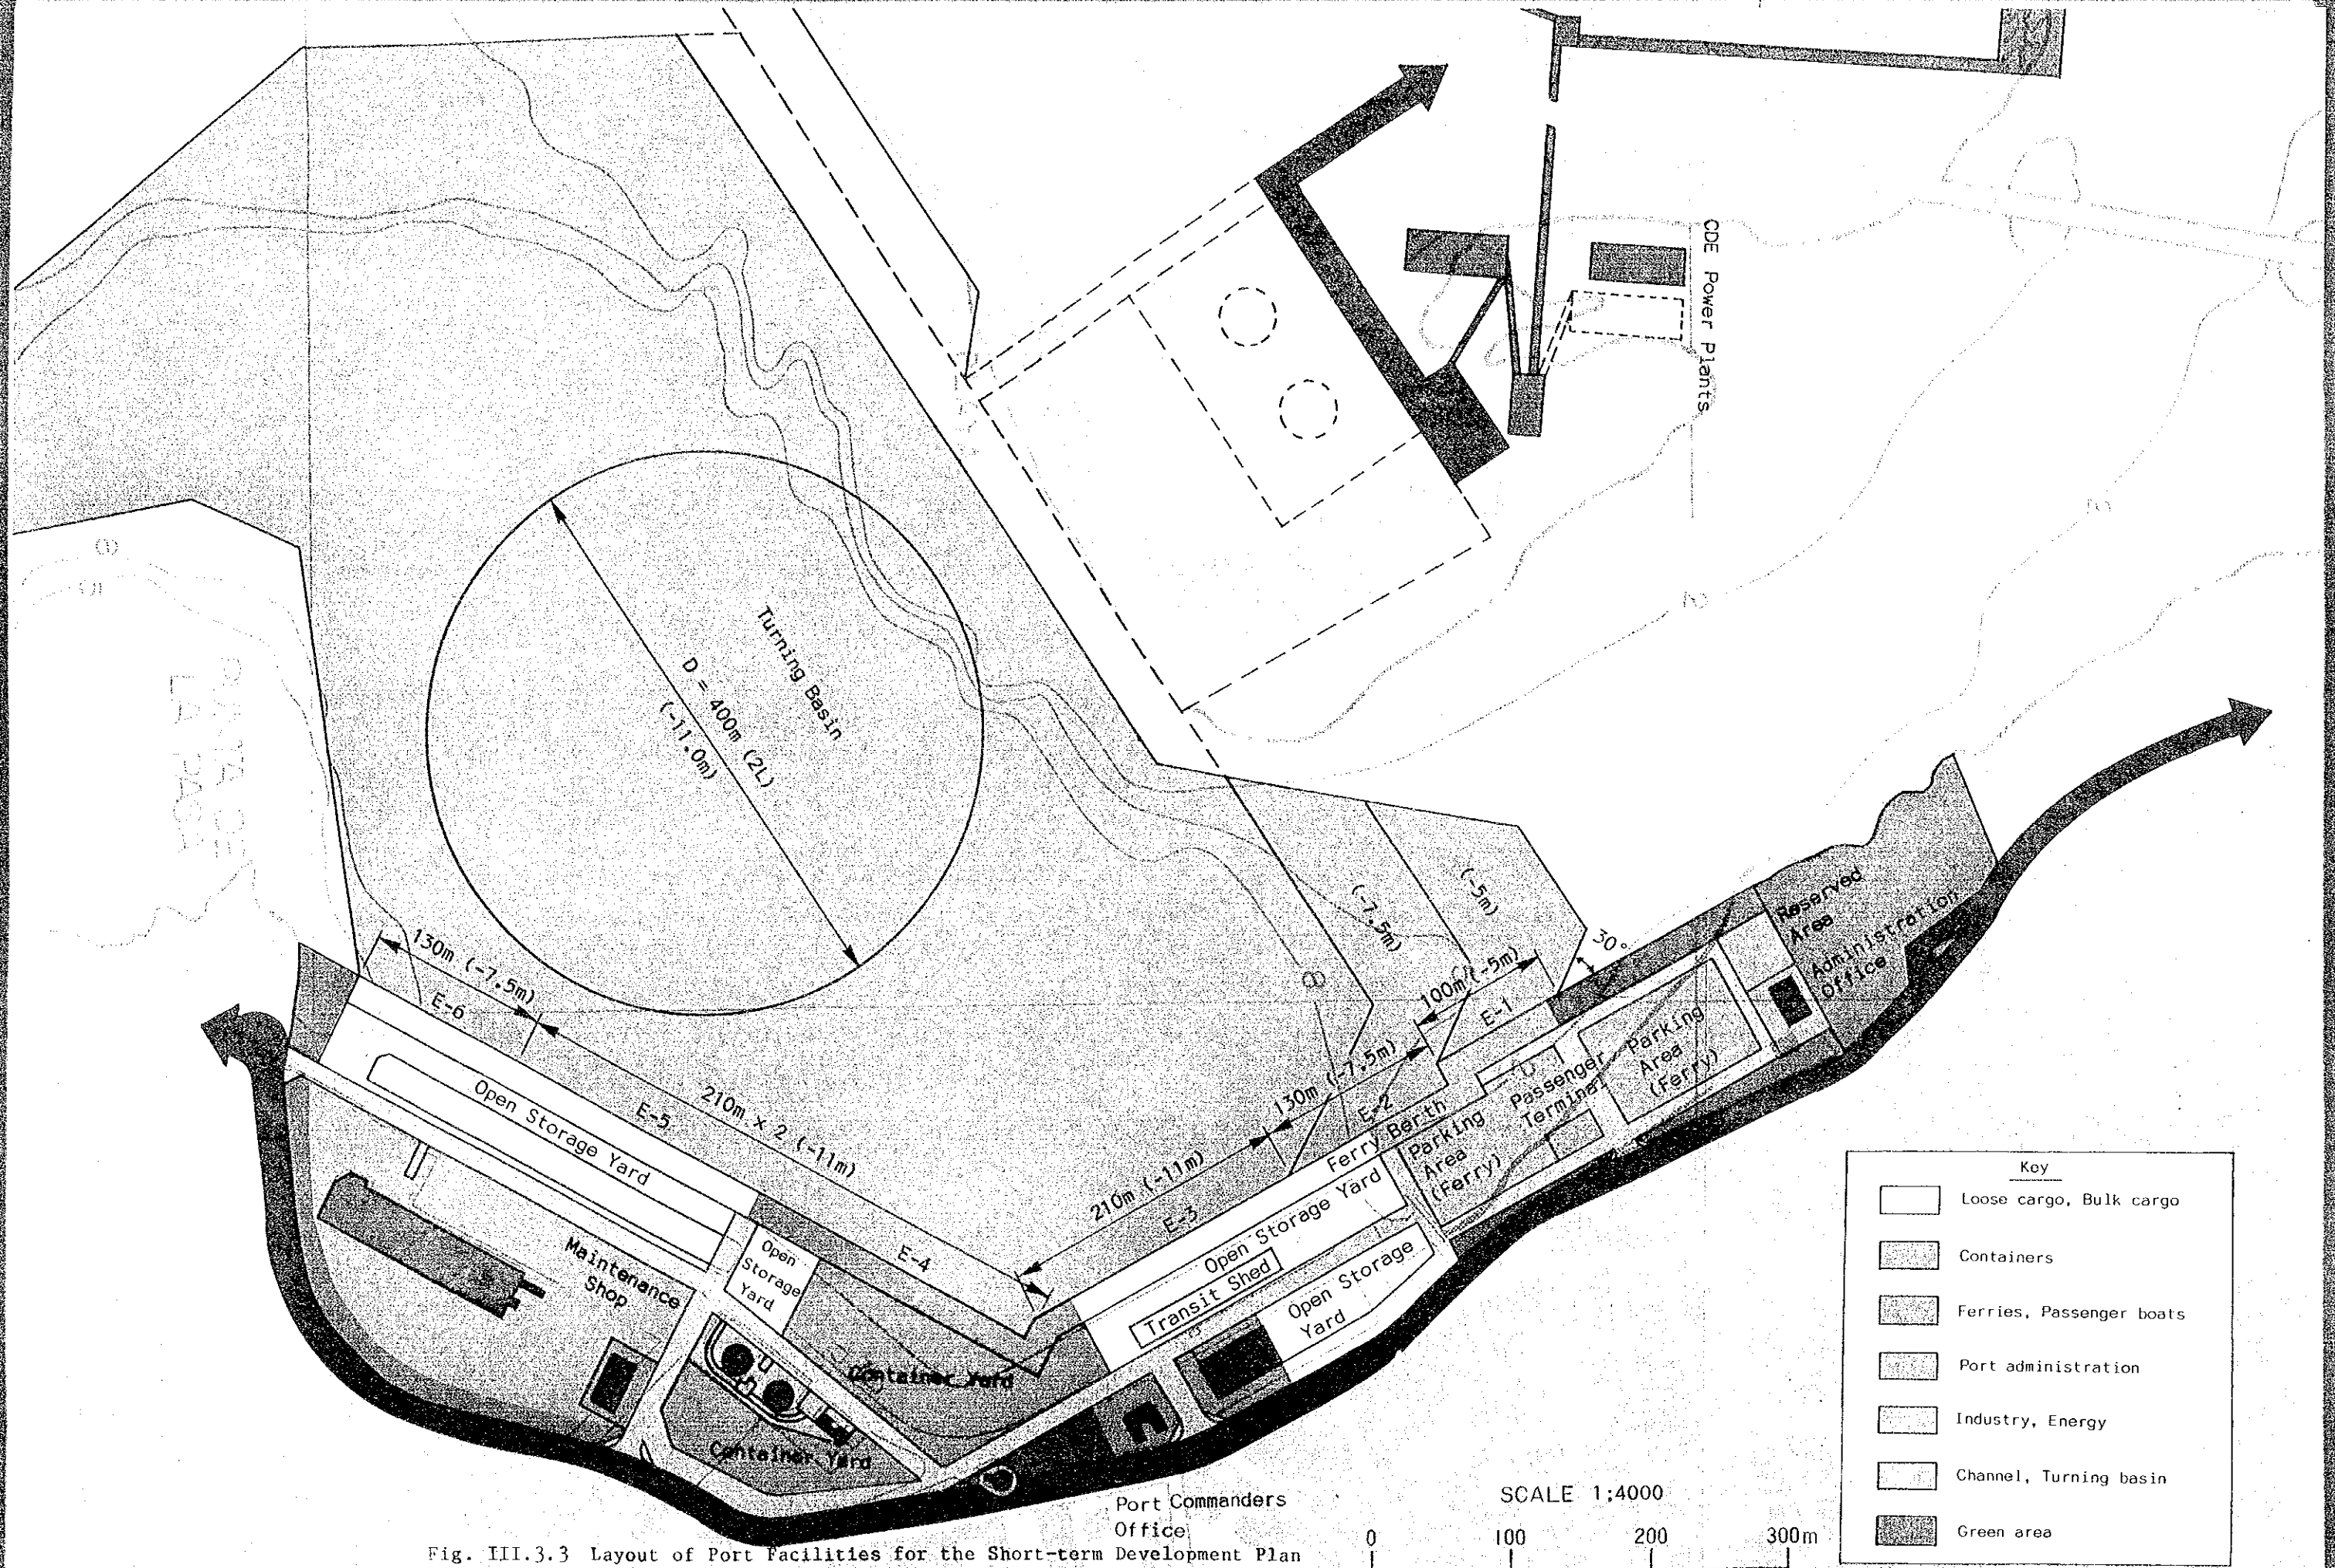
Layout of Port Facilities for the Short-term Development Plan
